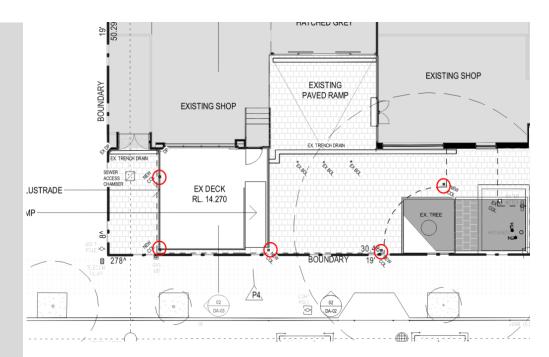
D2 - Loadbearing External Steel Columns Require FRLs
